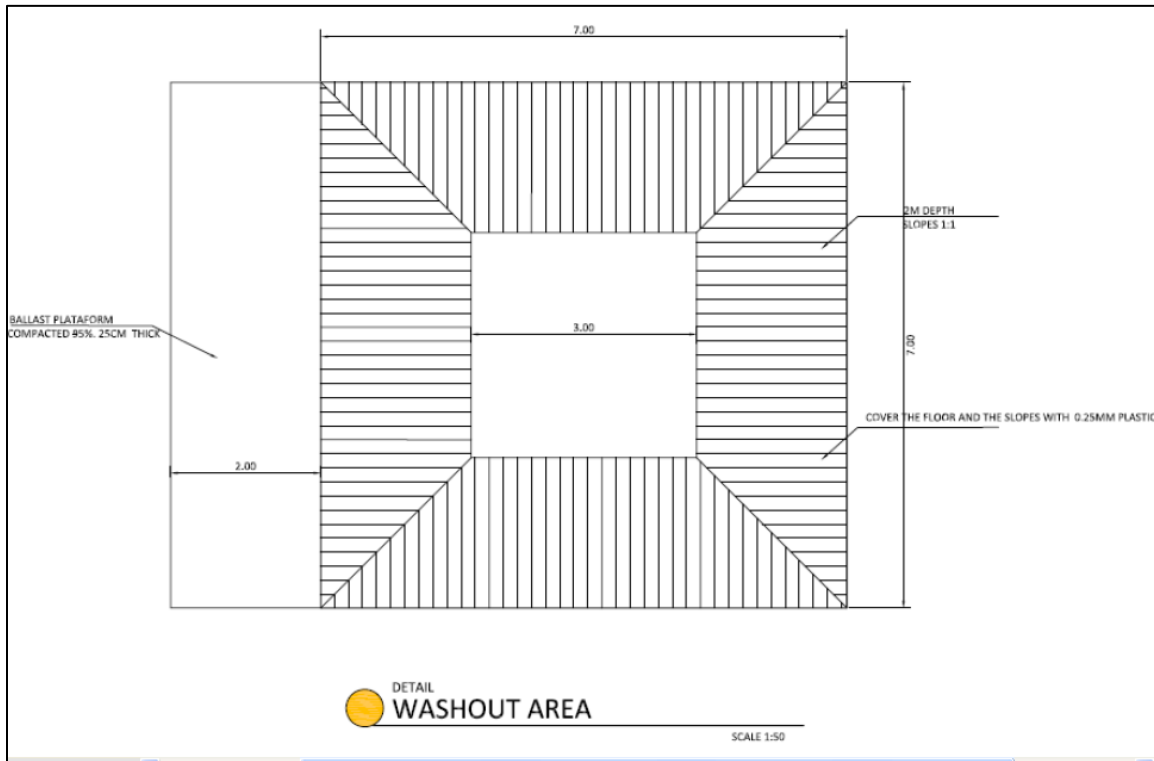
CONCRETE TRUCKS/ PUMPS WASHOUT PIT
